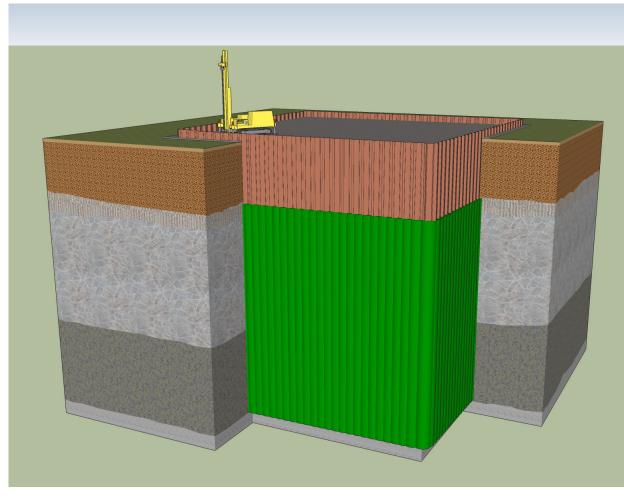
3D sketch of Jet Grouting vertical containment barrier.
